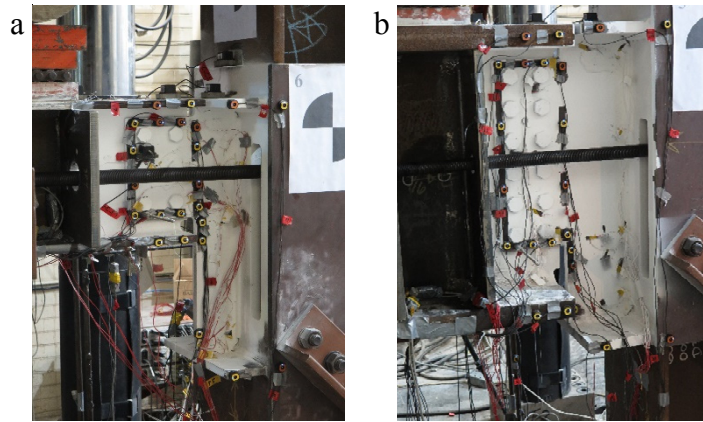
Specimens: (a) BG3-2-13-F-200C, (b) BG6-2-19-F-500C
